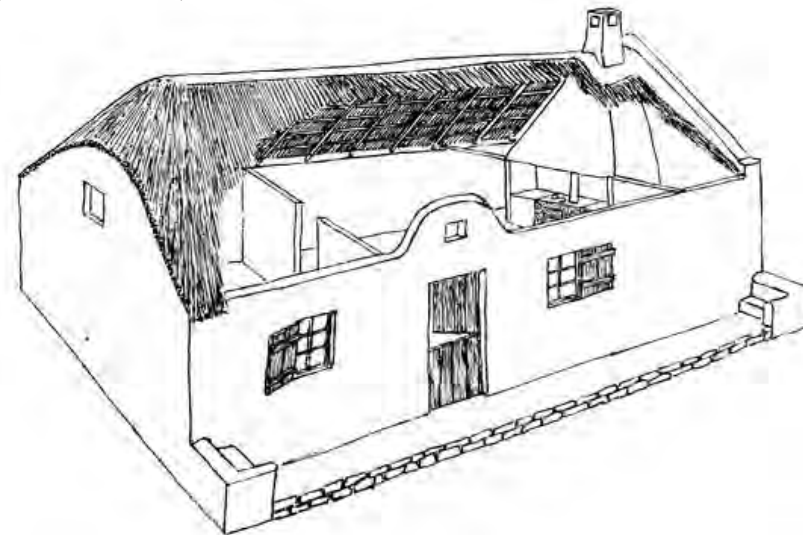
(ABOVE): Cut-away view of early vernacular dwelling construction with reed roof on timber beams. Note stone plinth to building. (VASSA)
